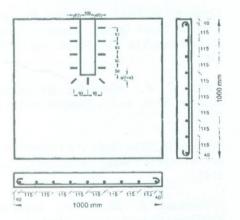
Arrangement of reinforcement and Location of I-sections of the model
